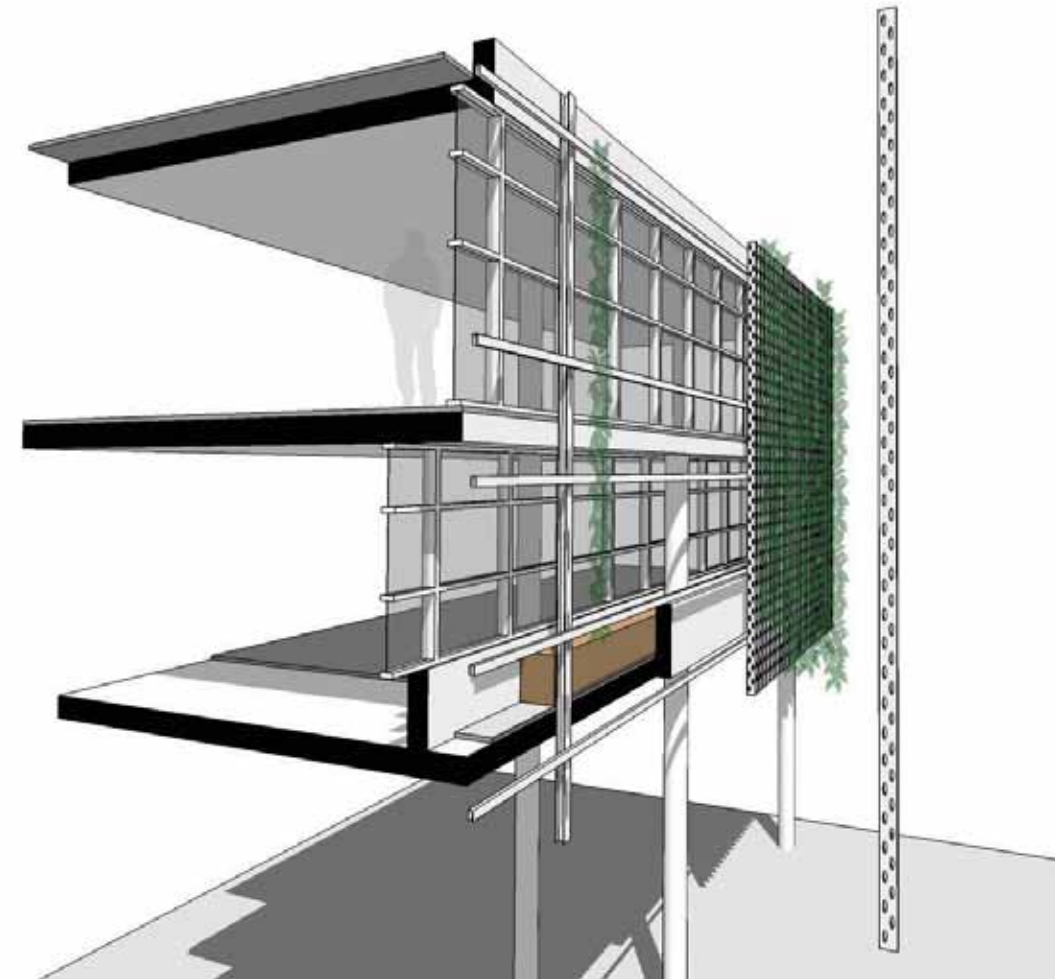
DETAIL D - SOLAR SCREEN AND BALUSTRADE DETAIL
